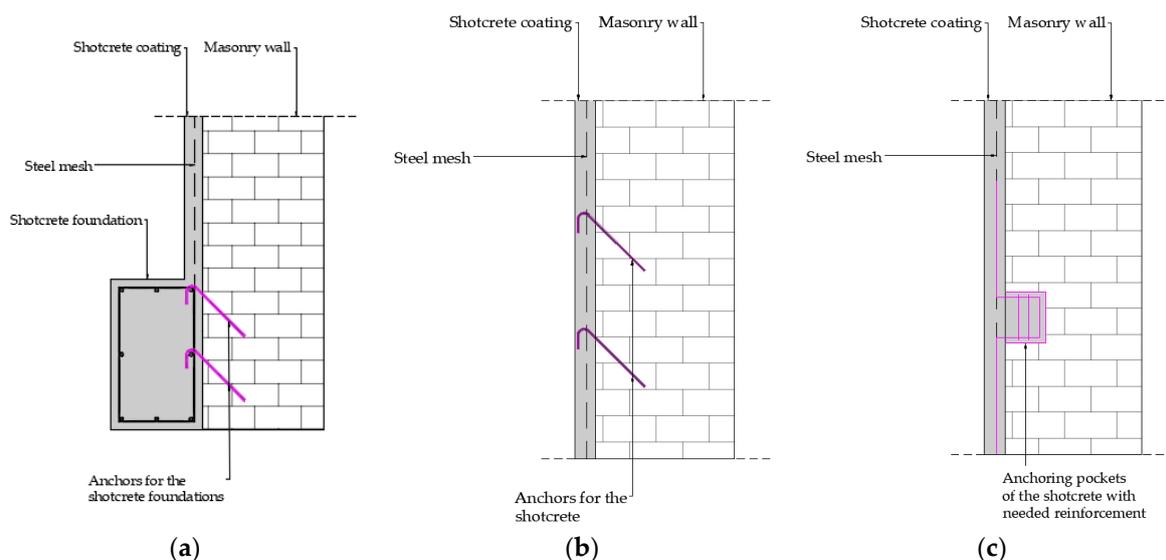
Details for single-sided concrete jacketing—(a) foundation detail. (b) Anchors for concrete jacketing. (c) Anchoring pockets for concrete jacketing.
